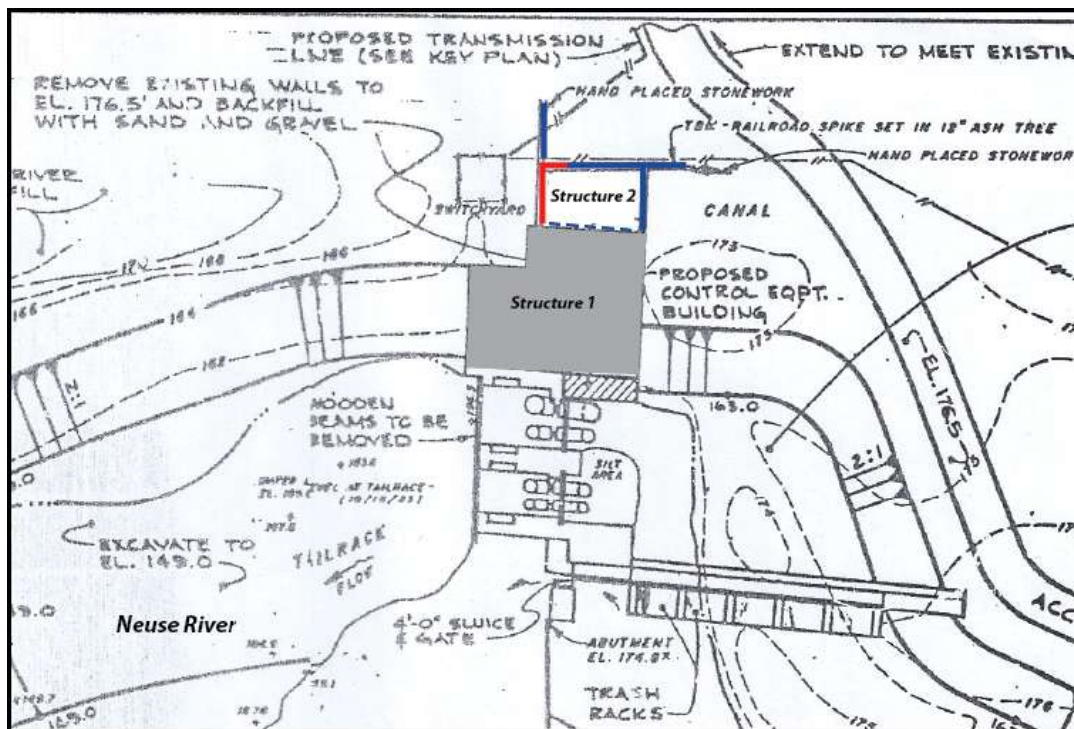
Excerpt of ca. 1980 proposed plan for the modern hydroelectric facility showing foundation walls located west of the powerhouse. Note: the red-shaded wall of Structure 2 is exposed; the blue-shaded wall is buried.
